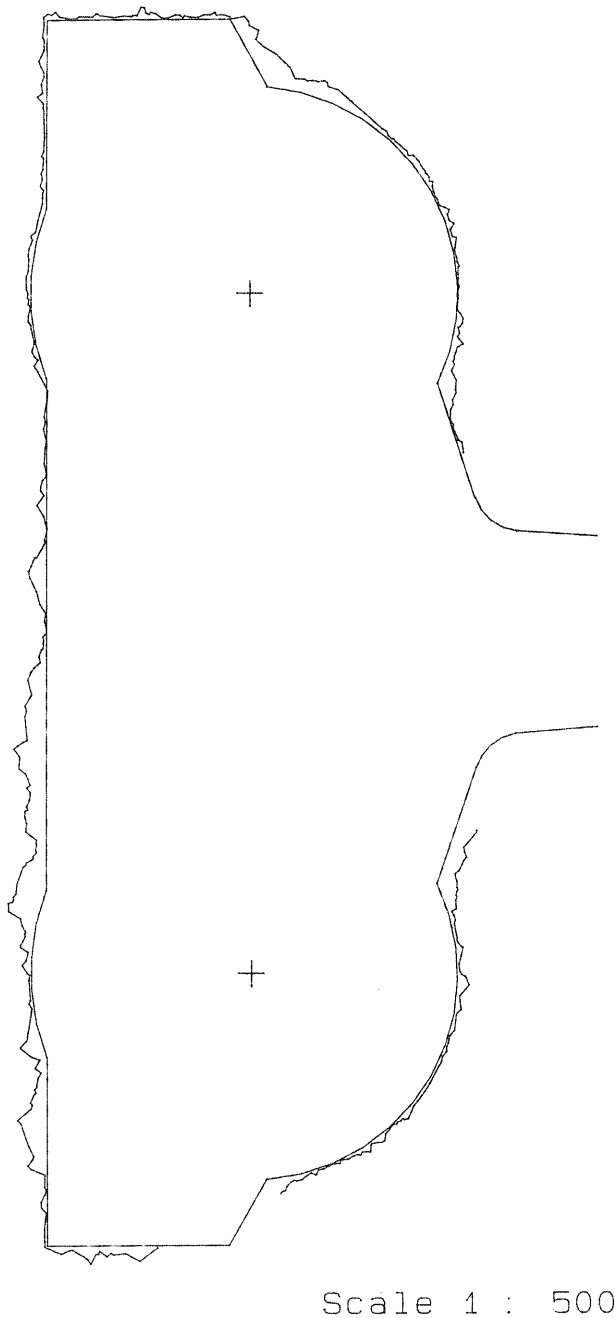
Typical Horizontal Section of the Pumpwells Excavation.
